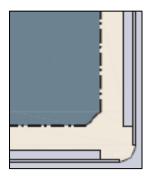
Wide sidewalks shall be provided along Memorial Drive to encourage pedestrian circulation through the corridor. (Source: Duany Plater-Zyberk & Co.)
